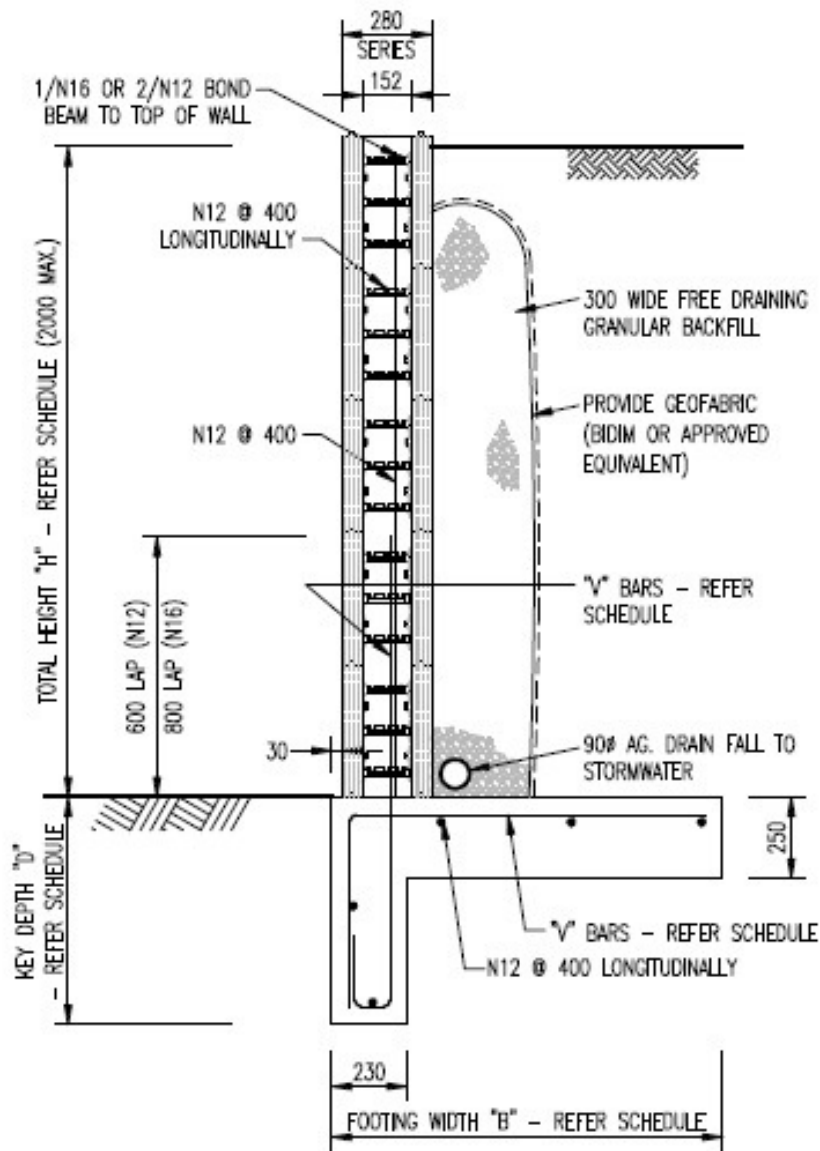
2000 – 2800 High Retaining Wall (280 Series Panels) Low Side Footing
